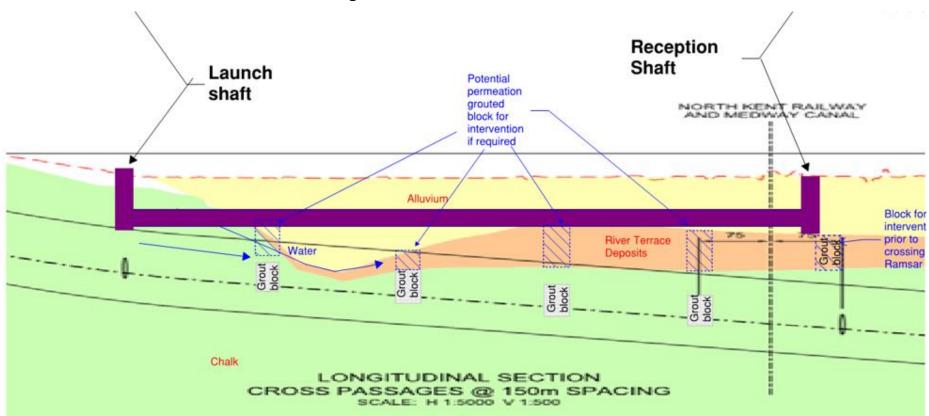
Longitudinal Section of Advanced Grout Tunnel
